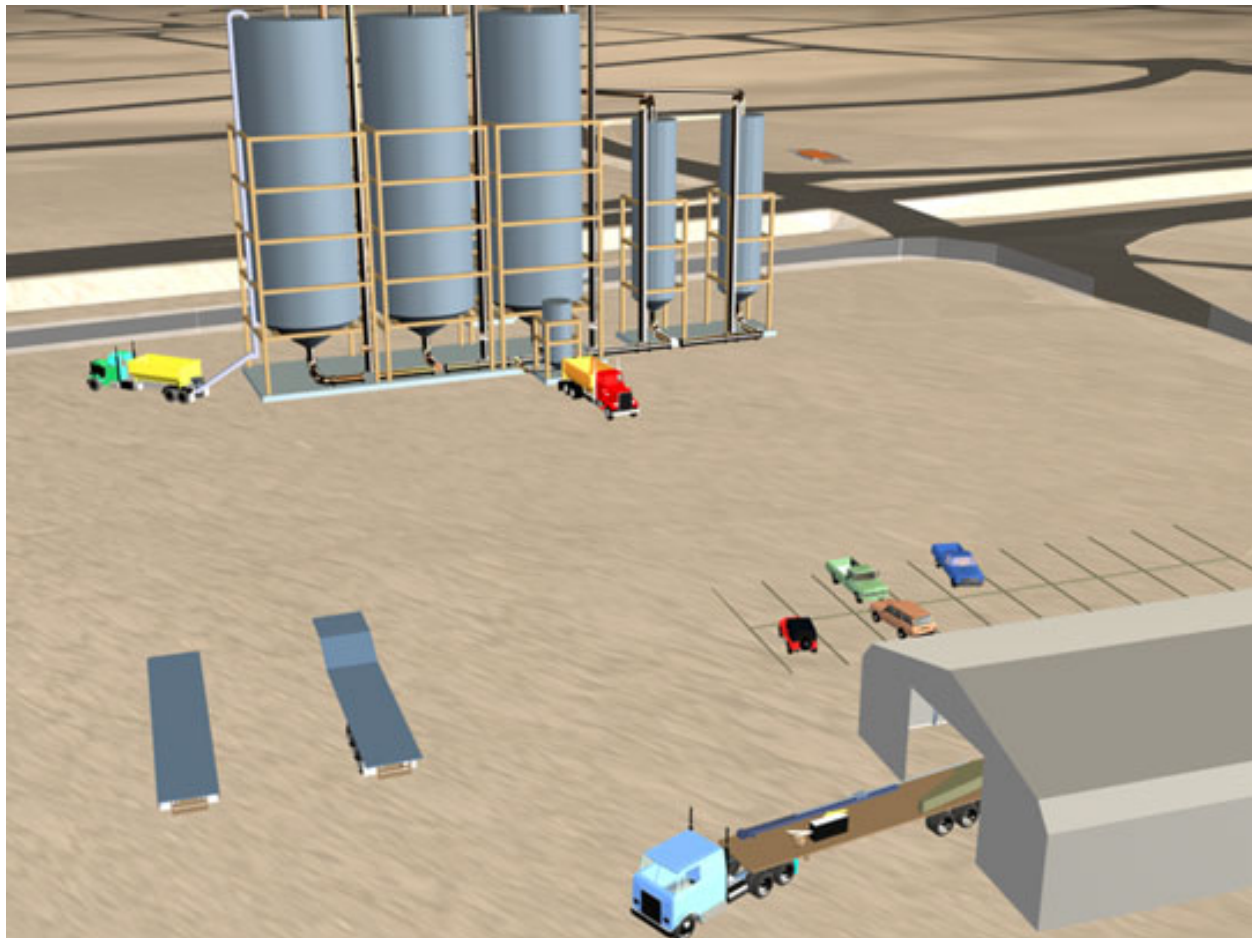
Perspective view of support facilities adjacent to the batch plant.
